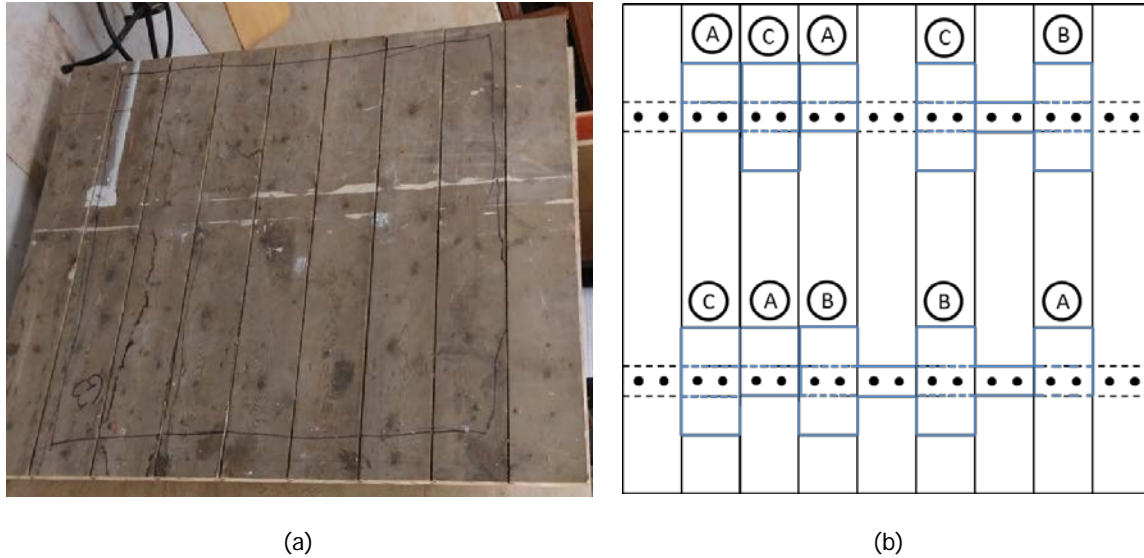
(a) First floor sample G3 with planks from Rengersweg 15, Godlinze [2], (b) overview of the test specimens that were extracted for the plank-joist connection test.
